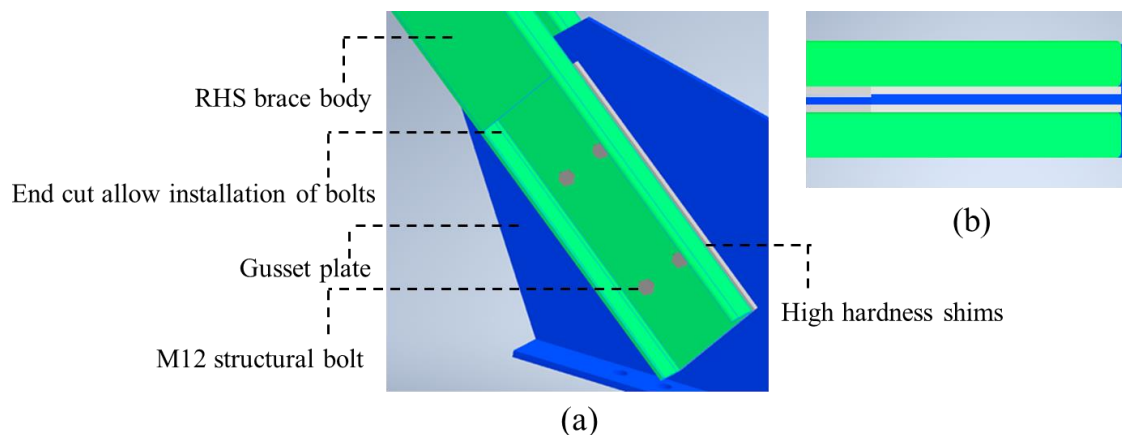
SFC at Brace to Gusset Plate Joint (a) Oblique View and (b) Plan View
